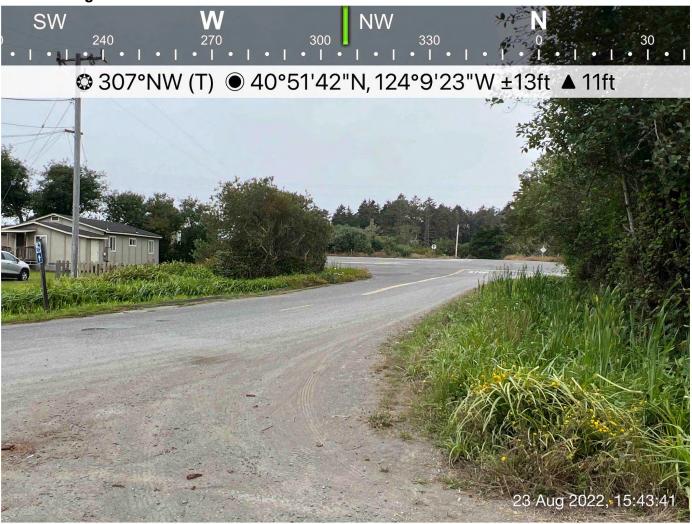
View from Young Lane to Highway 255, over 150 feet from the culvert replacement.
